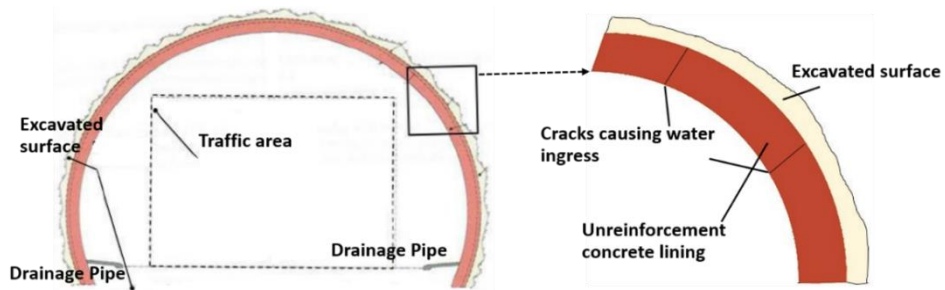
Zigana Tunnel design and pavement structure belonging to tunnel [11].
